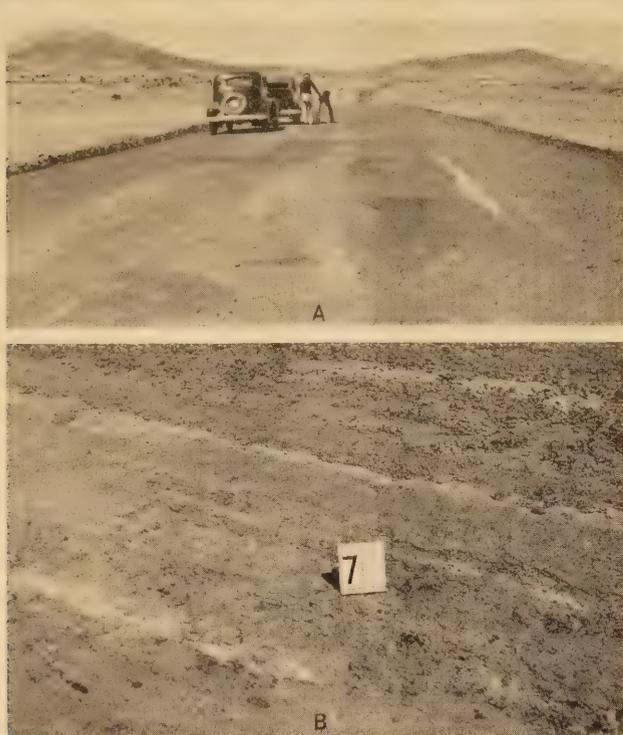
A, FAILED SECTION OF FAP 105-C THAT WAS BADLY CRACKED AND RUTTED; B, CRACKED AND SCALED PORTION OF FAP 105-C.
